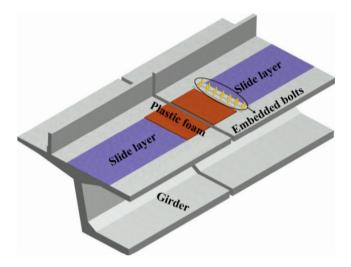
Typical girder joint for high-speed railway bridge (with ballastless track).
